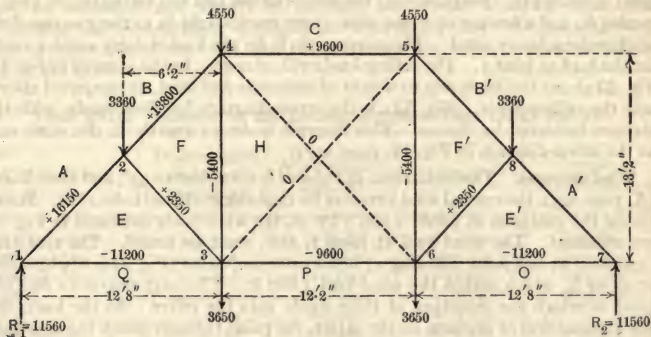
Queen Truss. Truss-diagram. (See, also, Figs. 3, 12 and 54 and Chapter XXVIII, Fig. 1)
